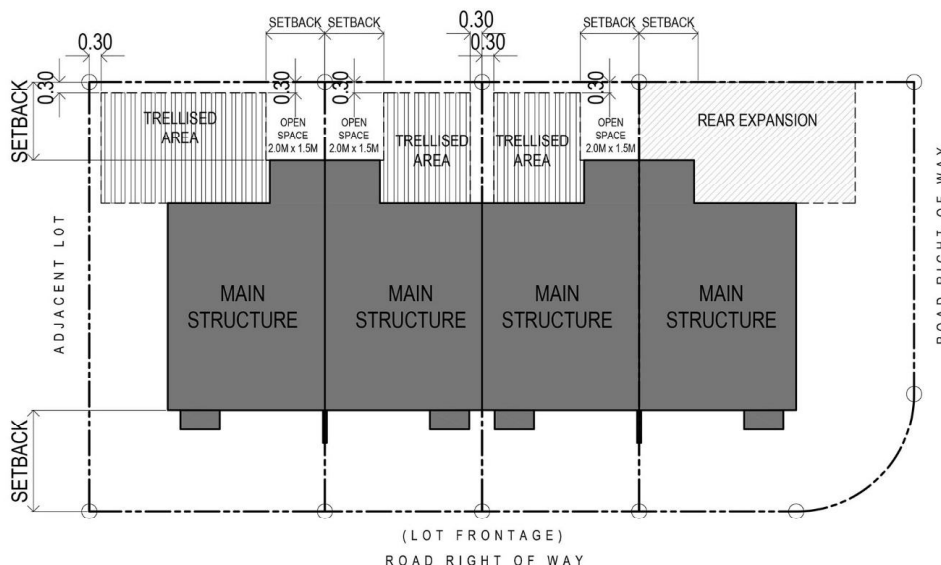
Trellised Area for BP220 Development - Townhouses - Second Floor
